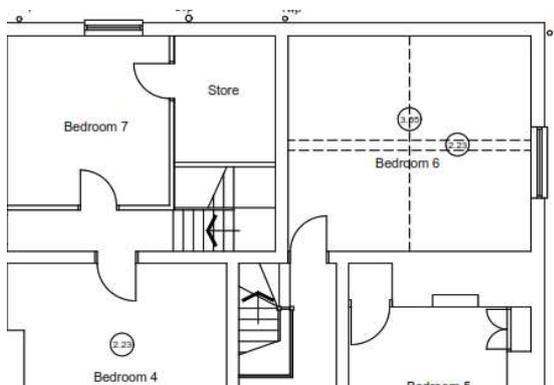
Existing 2<sup>nd</sup> Floor Layout (Savills:2020)
